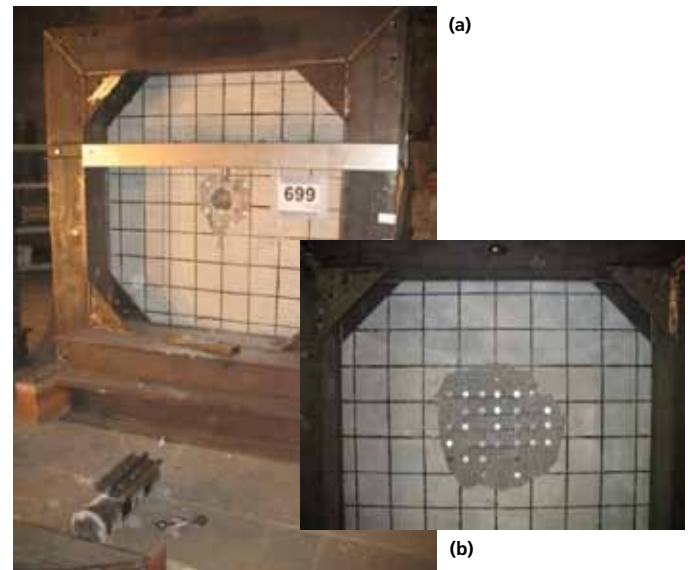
Hard missile impact on reinforced concrete slab: (a) impact face and (b) back face (VTT)
